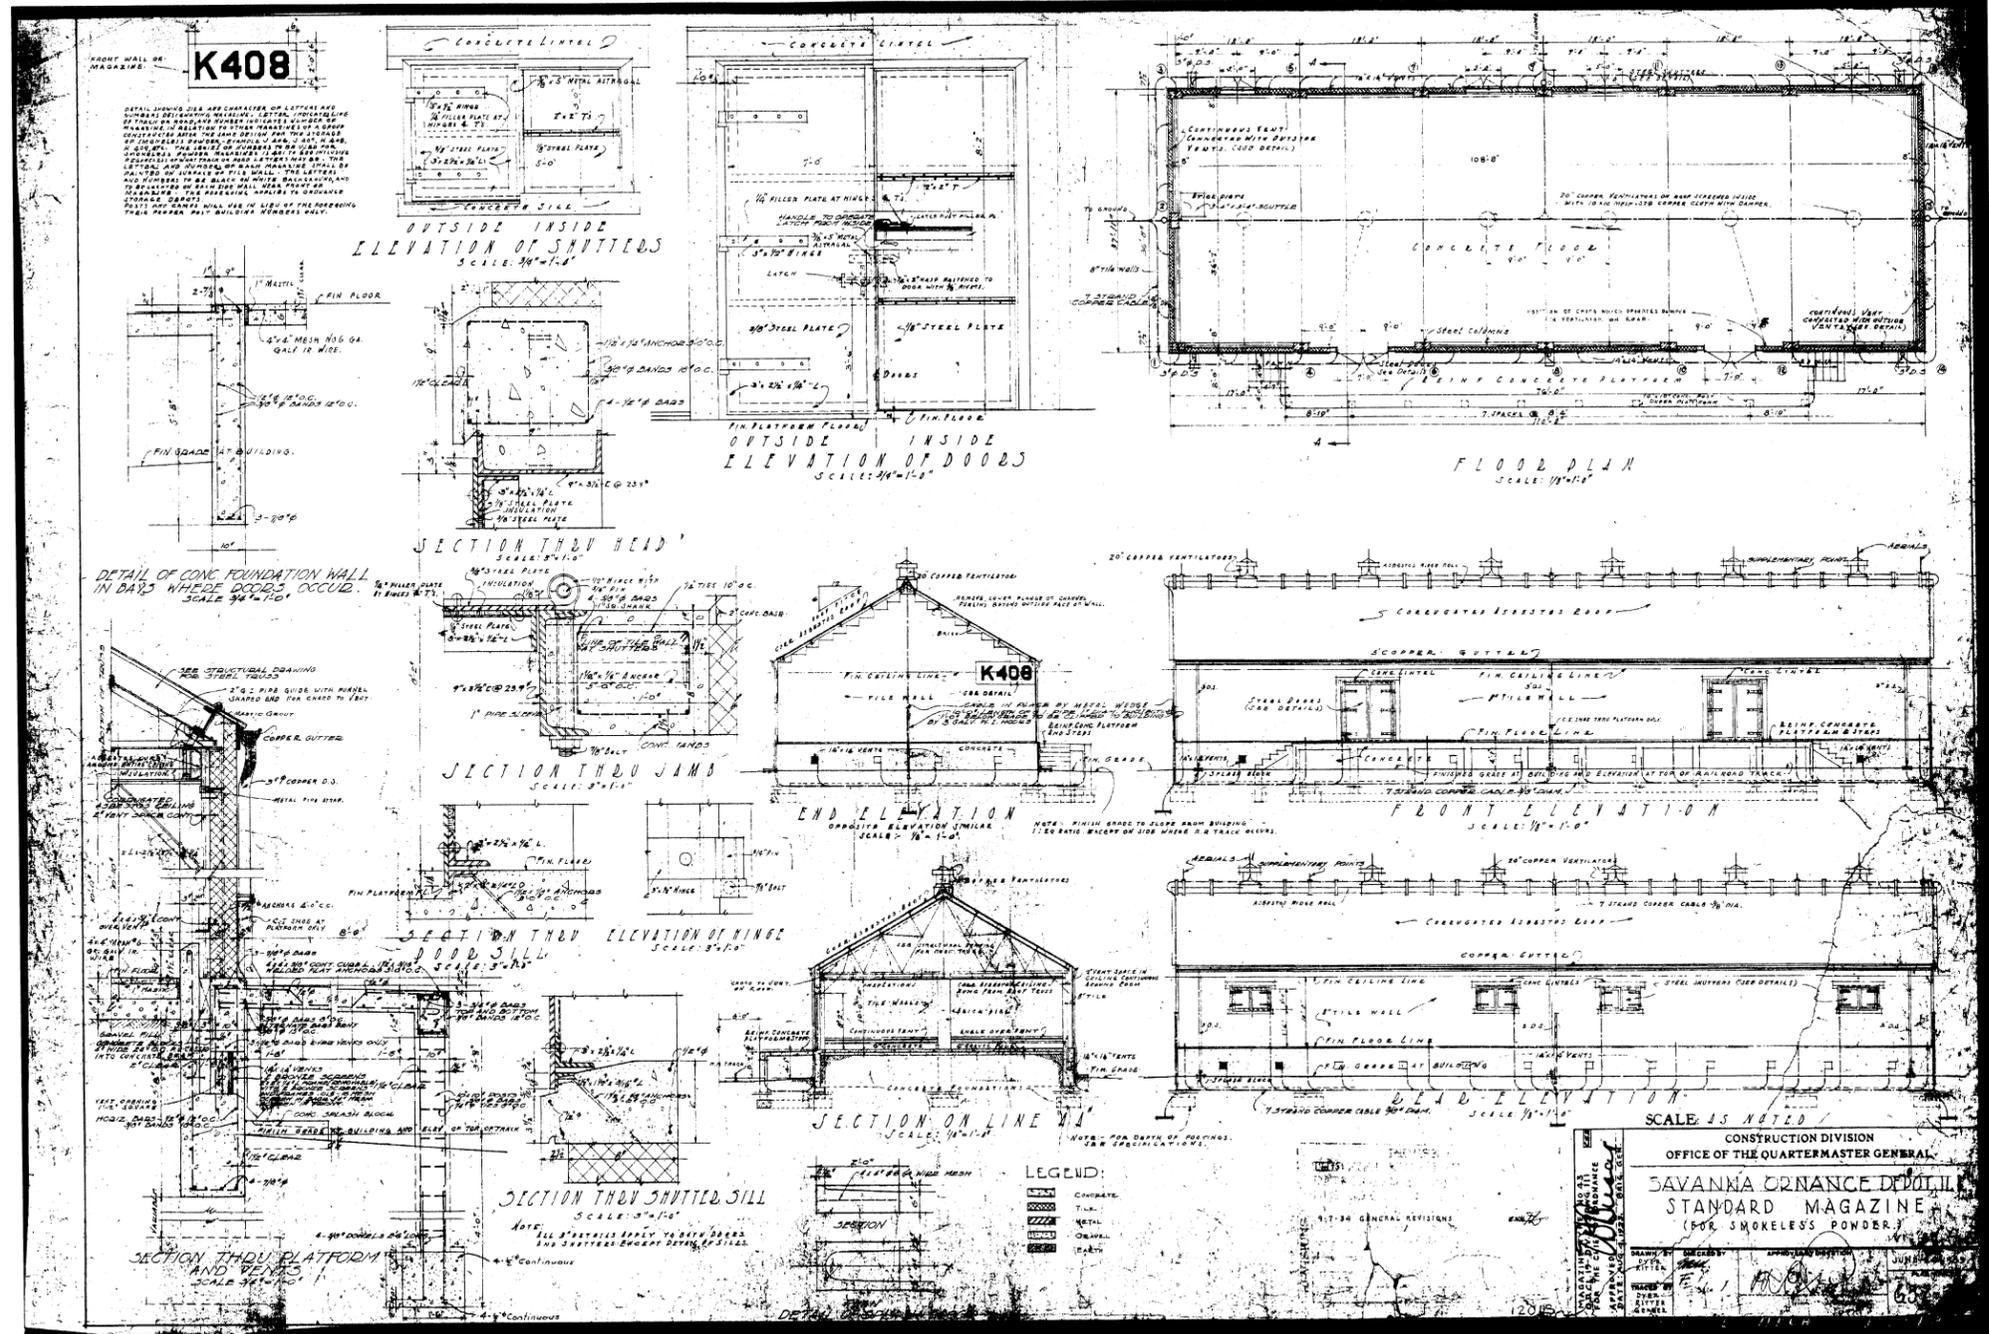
Plans and elevations for standardized aboveground magazine for smokeless powder.
